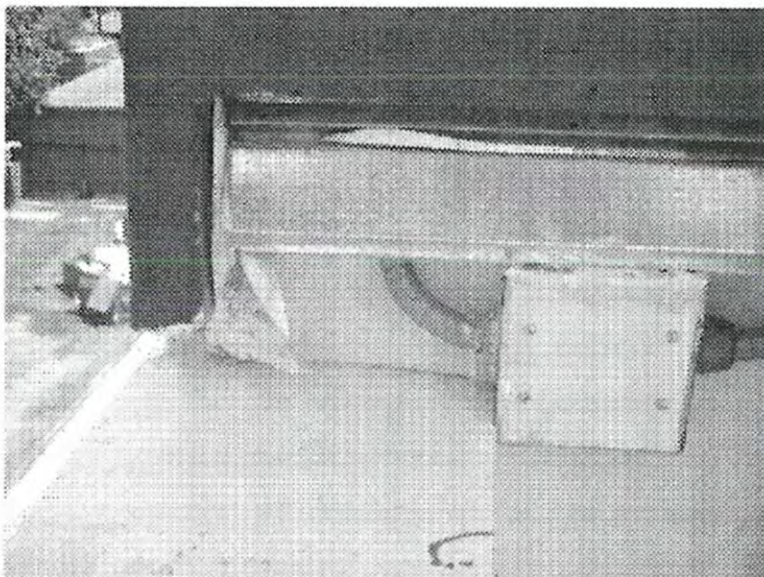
Lack of sealing of weather barrier at wall base on roof of Building A.
